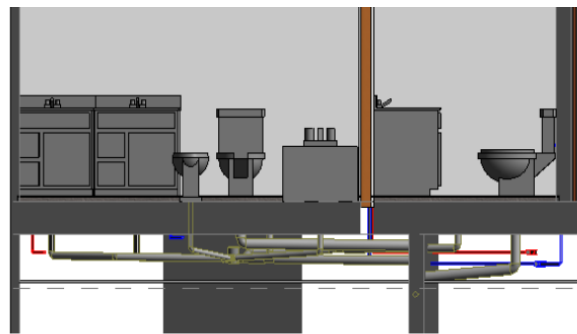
Clash detection for plumbing performed within a suspended ceiling
